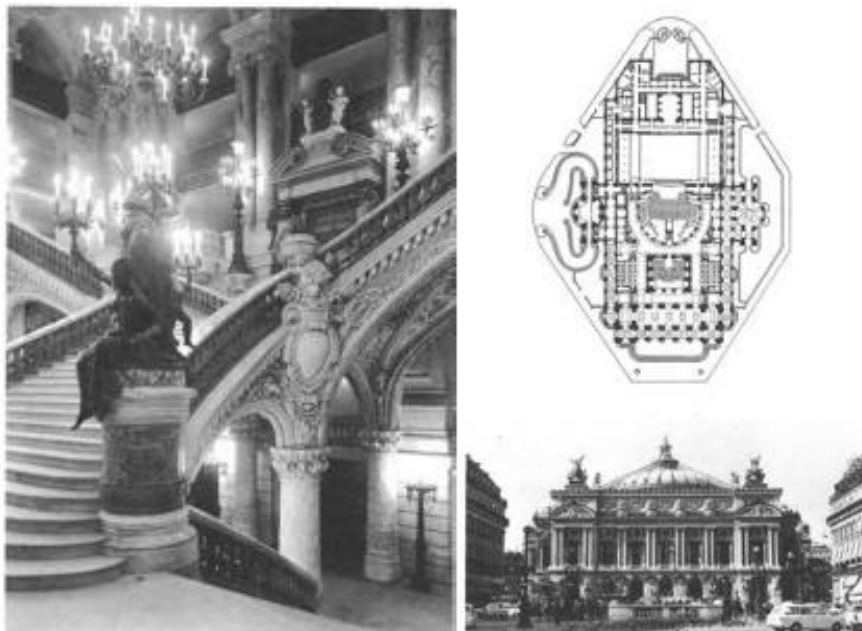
4. Opera of Paris, Staircase, Plan, and elevation (Source: Pevsner, 2023 , p.85)
